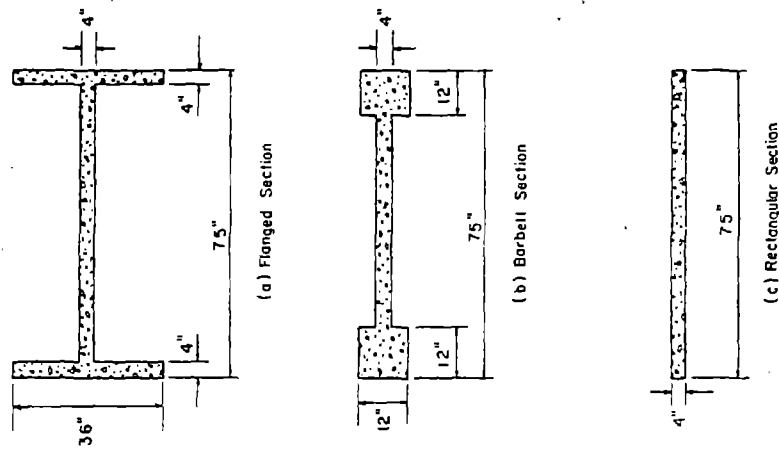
Nominal Cross-Sectional Dimensions of Test Specimens
